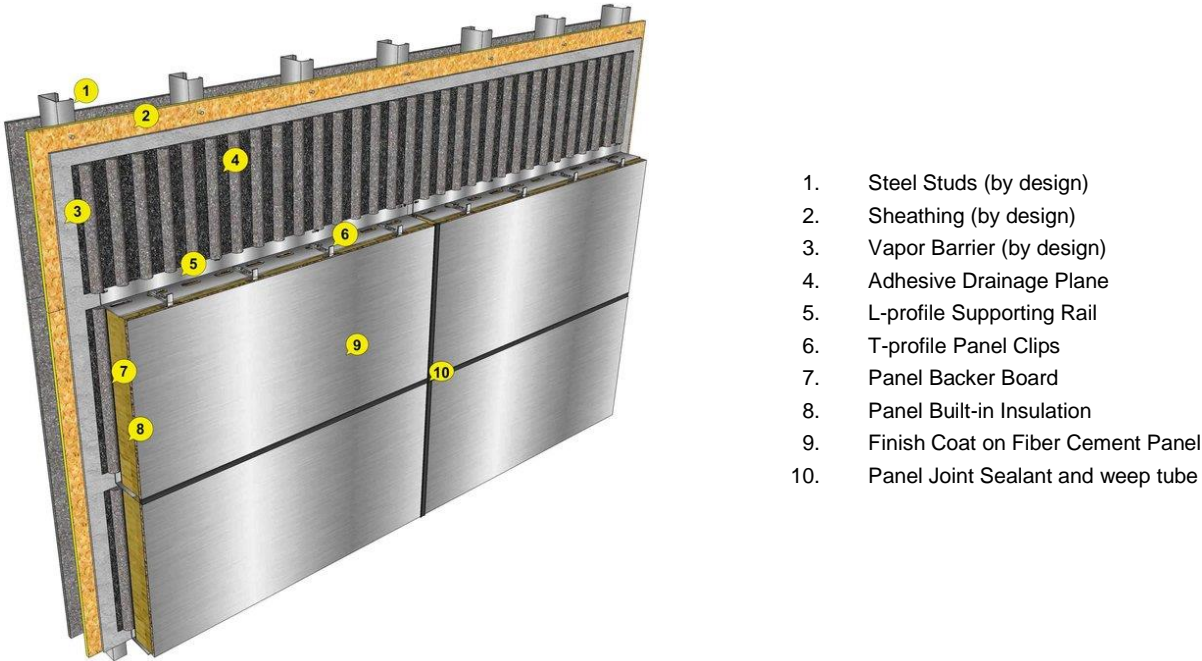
ILLUSTRATION OF A WALPANEL WALLSHELL® THERMAL PANOPLY PANEL SYSTEM SUPPORTED BY A LT ANCHORING SYSTEM
